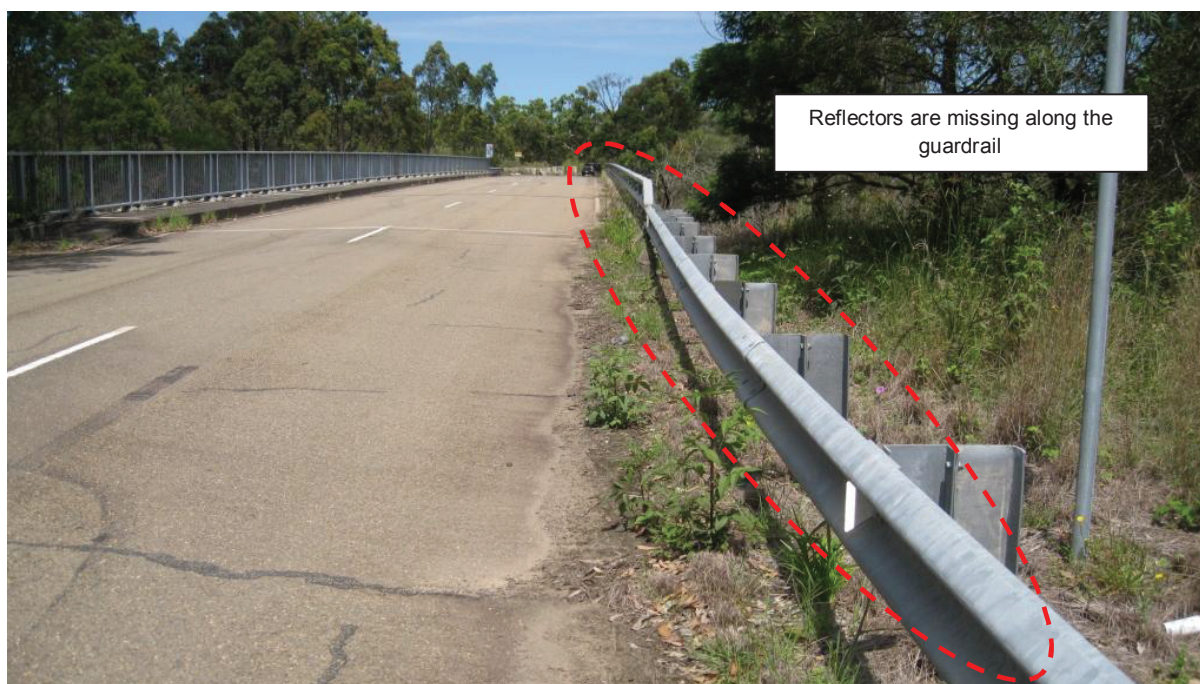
Tooheys Road, looking south towards the Tooheys Road/Motorway Link Road interchange
